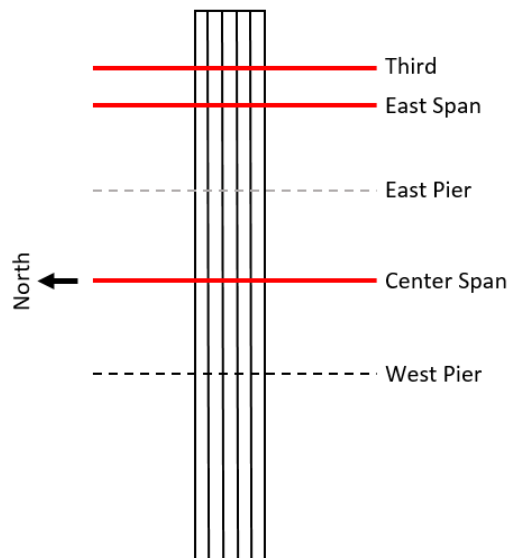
Maple Bridge instrumented unbraced dry run cross-sectional locations
